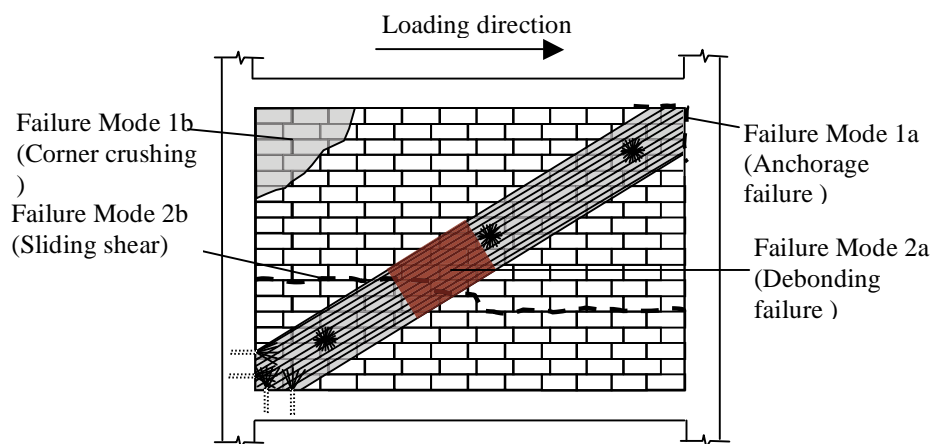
Failure modes of FRP strengthened infill wall in a reinforced concrete frame
